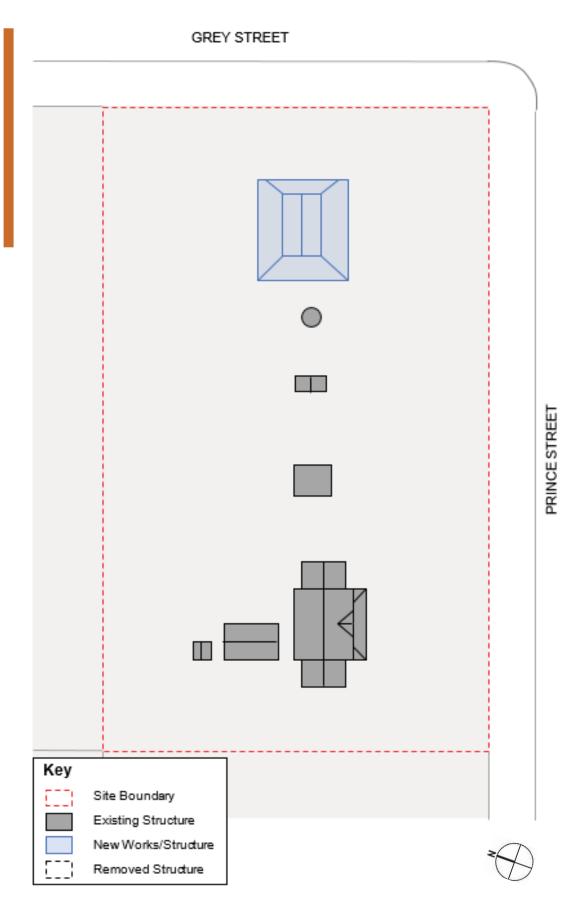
Clarence Town Courthouse and site period of construction - 1957. NOTE: Minor works to the verandahs and interiors of the Courthouse building were undertaken during 1957.
